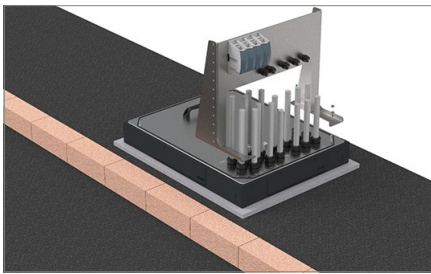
Positioning the setting gauge and fixing it to the press-in bolt and using a hexagon head screw.
